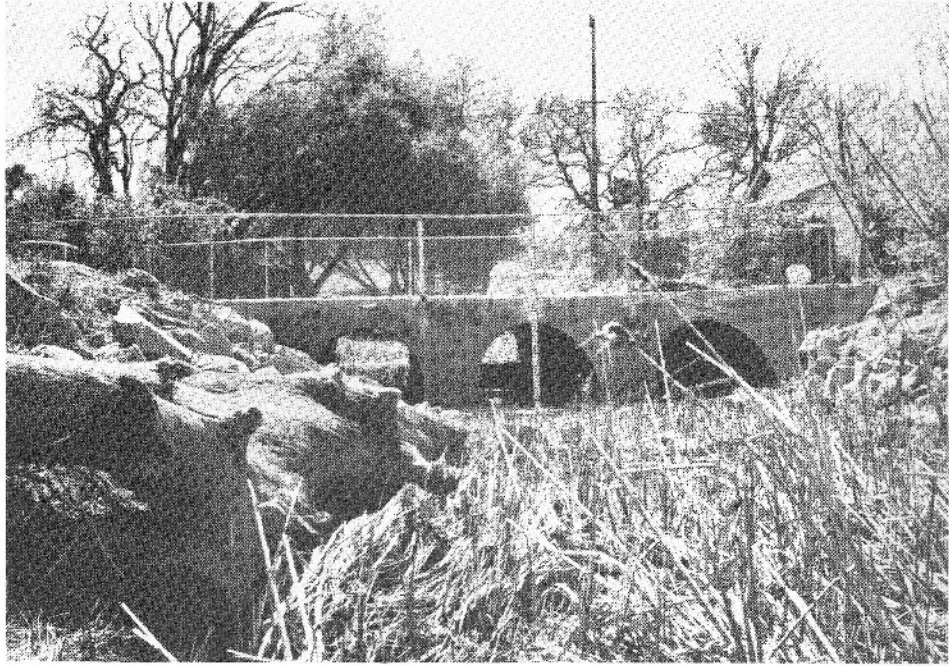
Southern Pacific Railroad crossing of Dry Creek at Booth Road subway.
